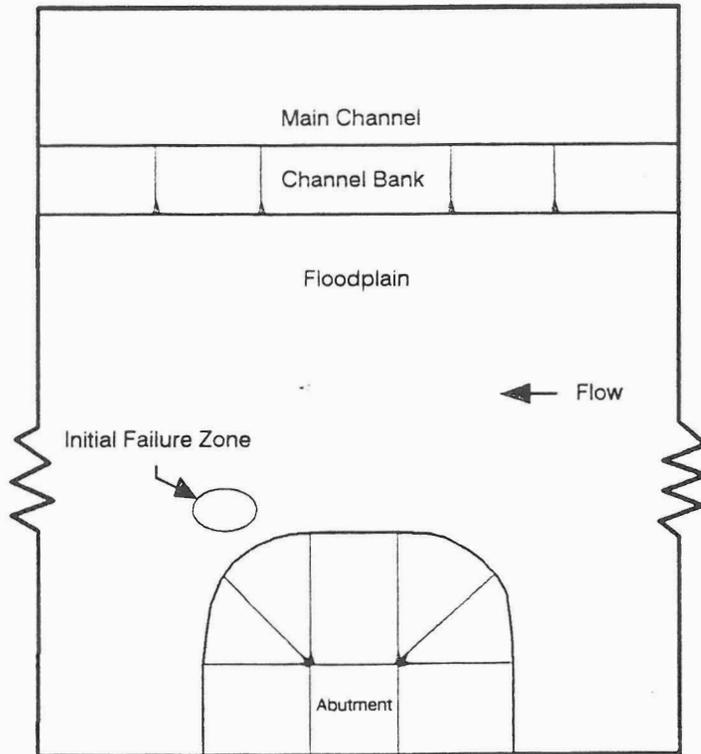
Plan View of the Location of Initial Failure Zone of Rock Riprap for Spill-Through Abutment.
